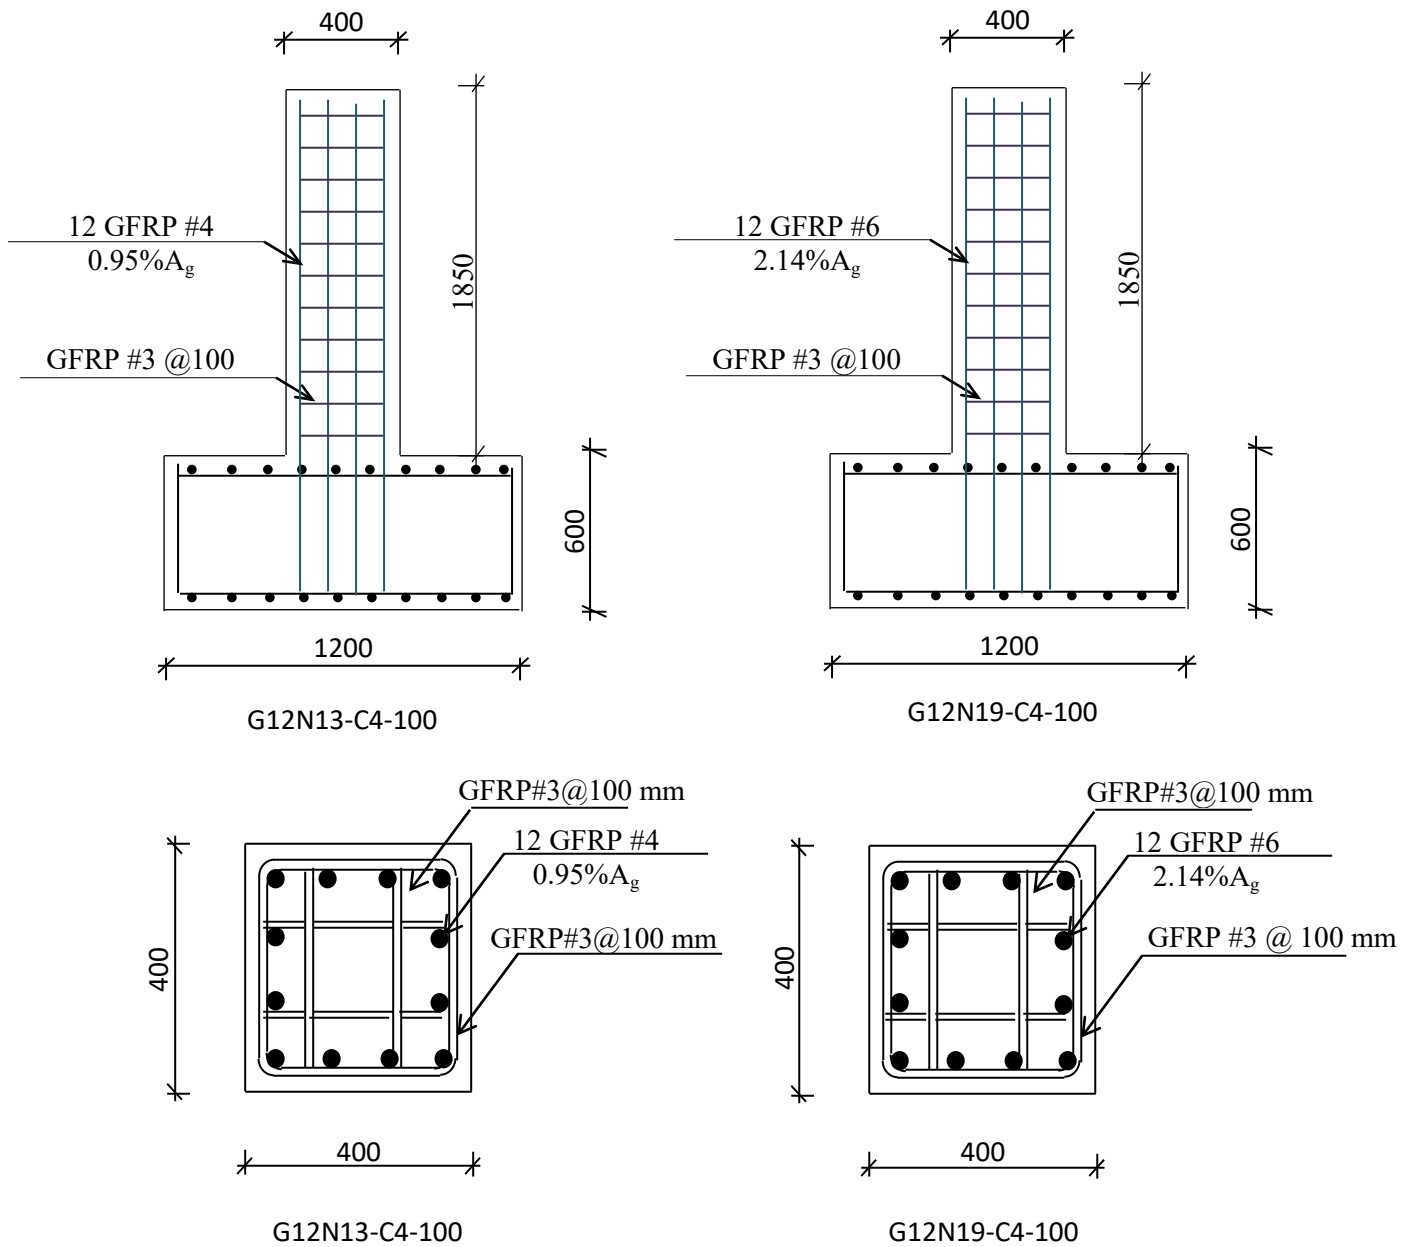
Concrete dimensions and reinforcement details (dimensions in mm)
